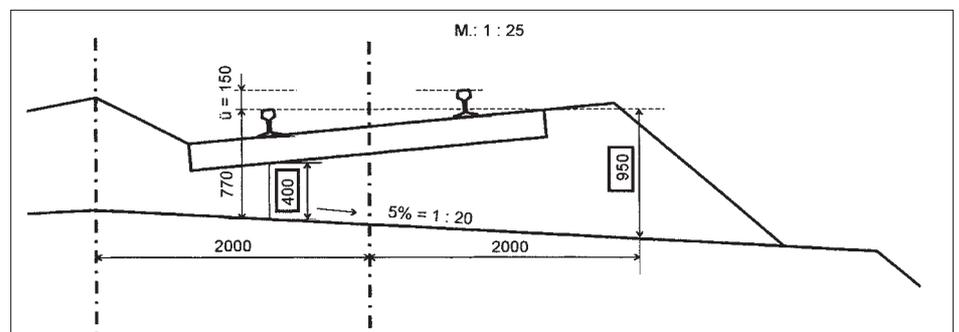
Excavation depth in the track for double track line, ballast profile for cleaning machine (UIC 60 rail, concrete sleepers)
